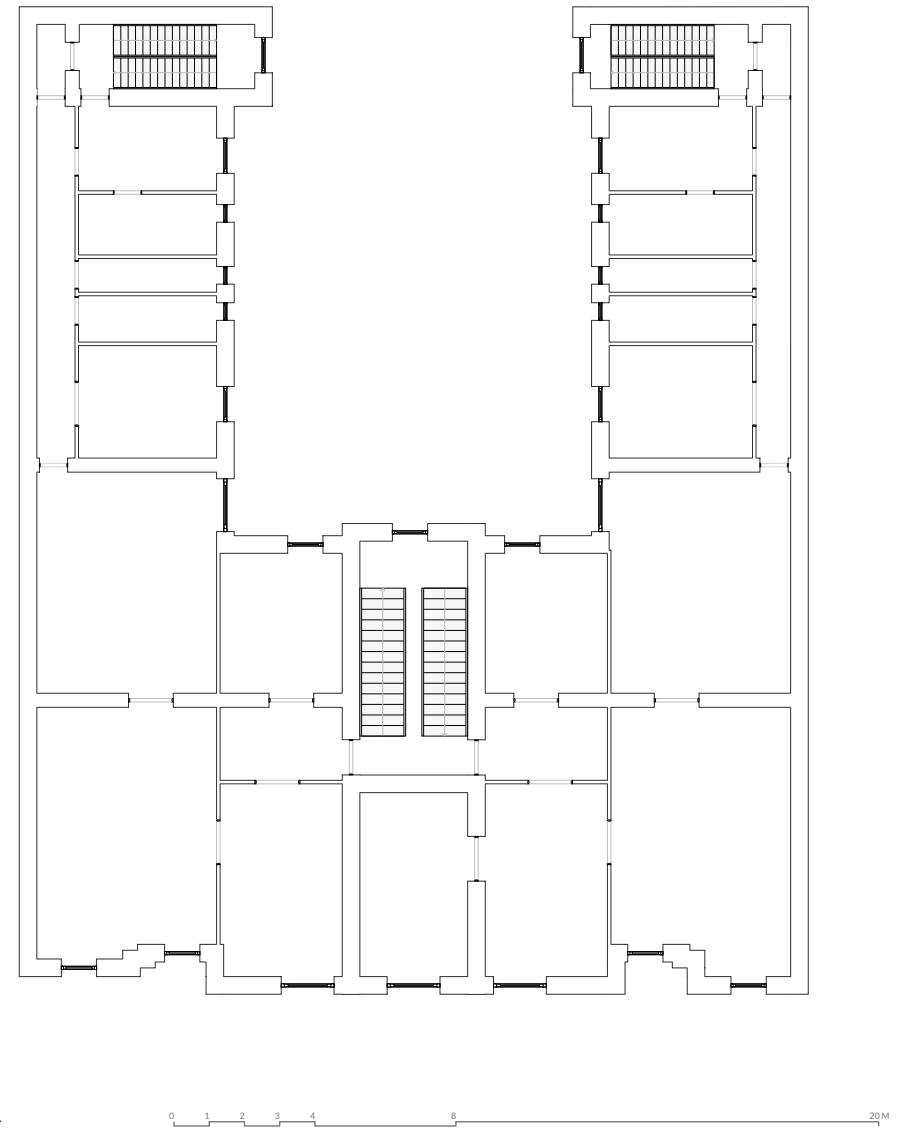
Alberta street 4 floor plan. Created by Eliza, 2025.
